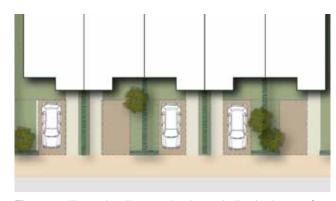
Illustrative diagram showing an indicative layout of on-plot front parking.
